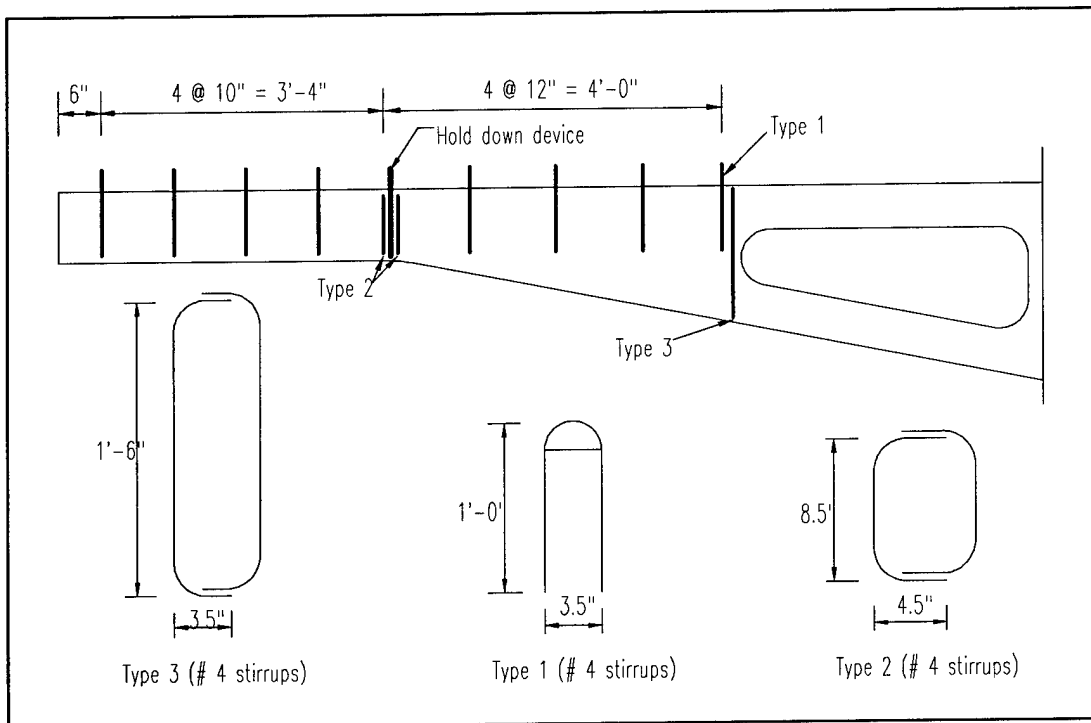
HJ-3 and HJ-4 web reinforcement.
